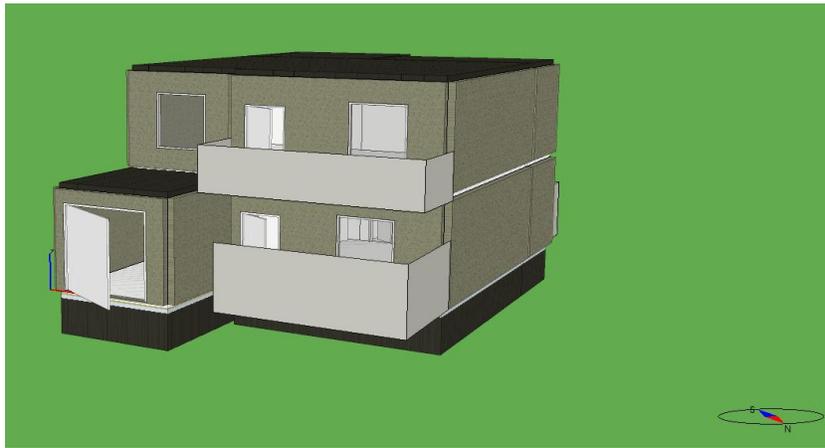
Elevation of the contemporary house. Original building simulation model [Source: Author].
